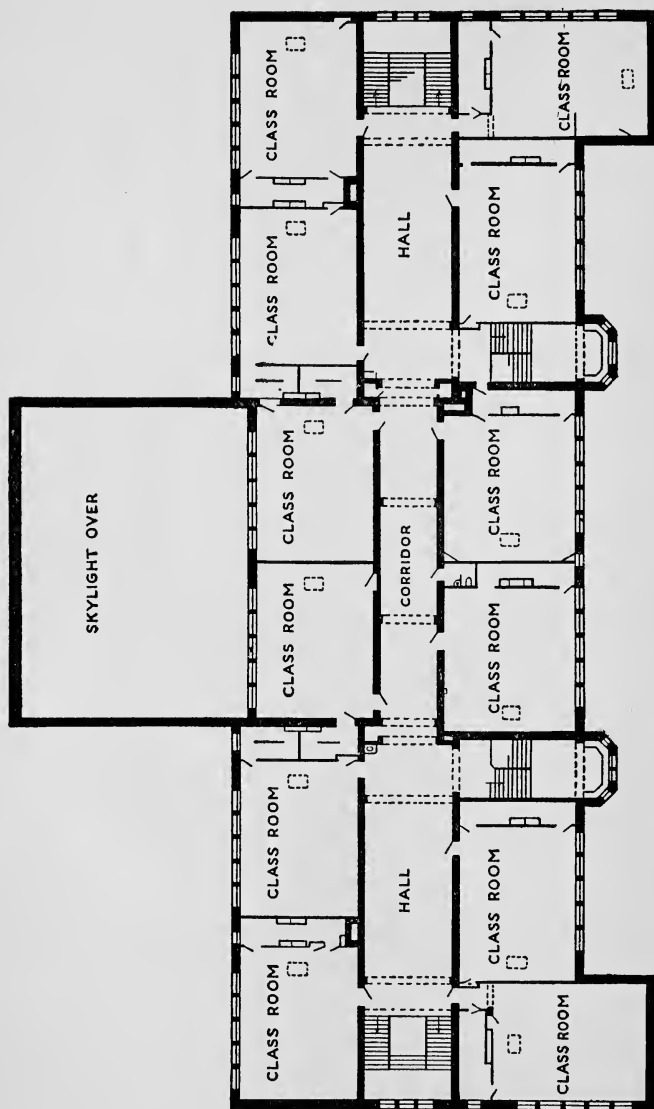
SECOND-FLOOR PLAN OF A SUGGESTED TYPE OF SCHOOLHOUSE
